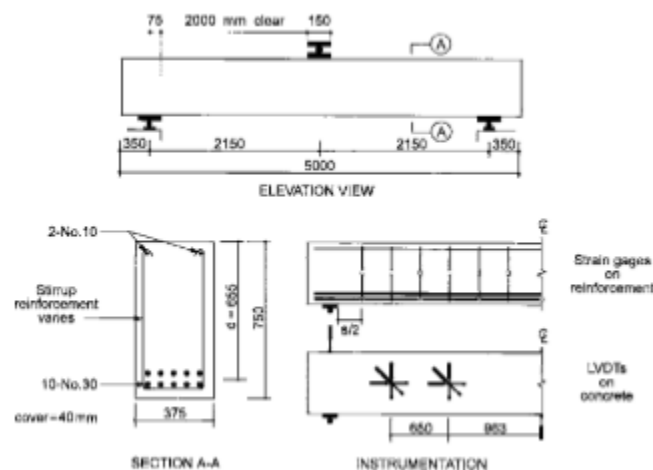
Details of beam specimens (from Yoon et al. 1996)
